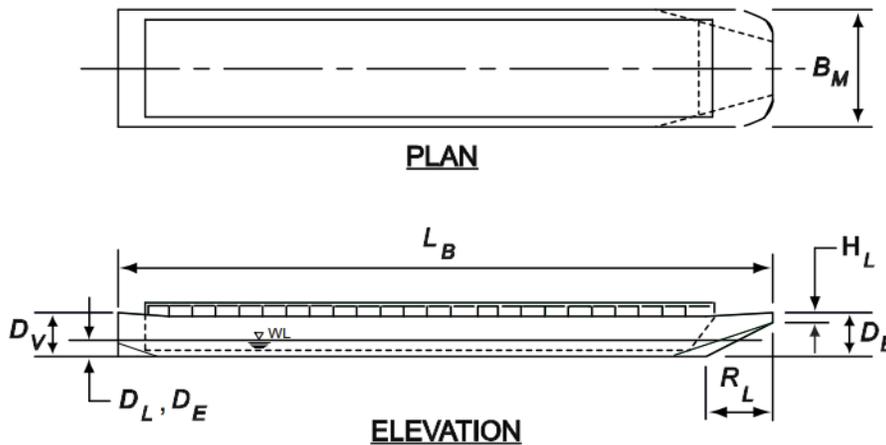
Design Barge Tow Plan and Elevation View
